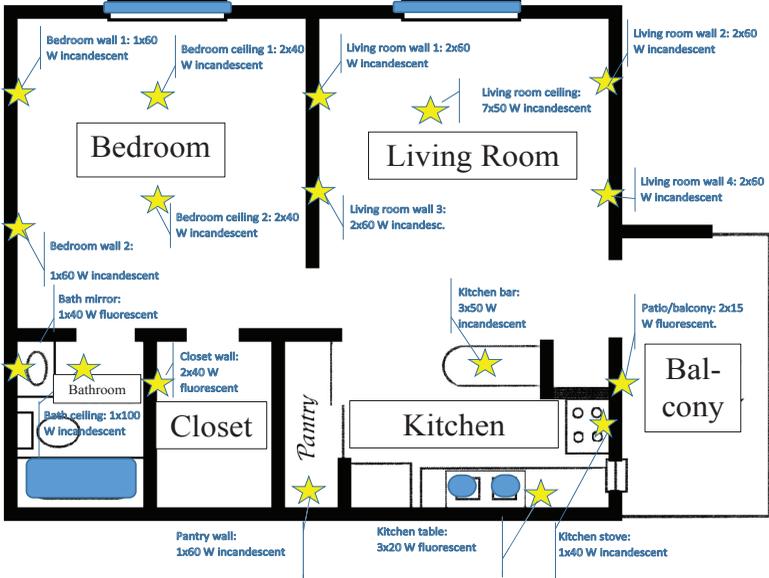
Floor plan of a one bedroom very small apartment with description of the lights.
